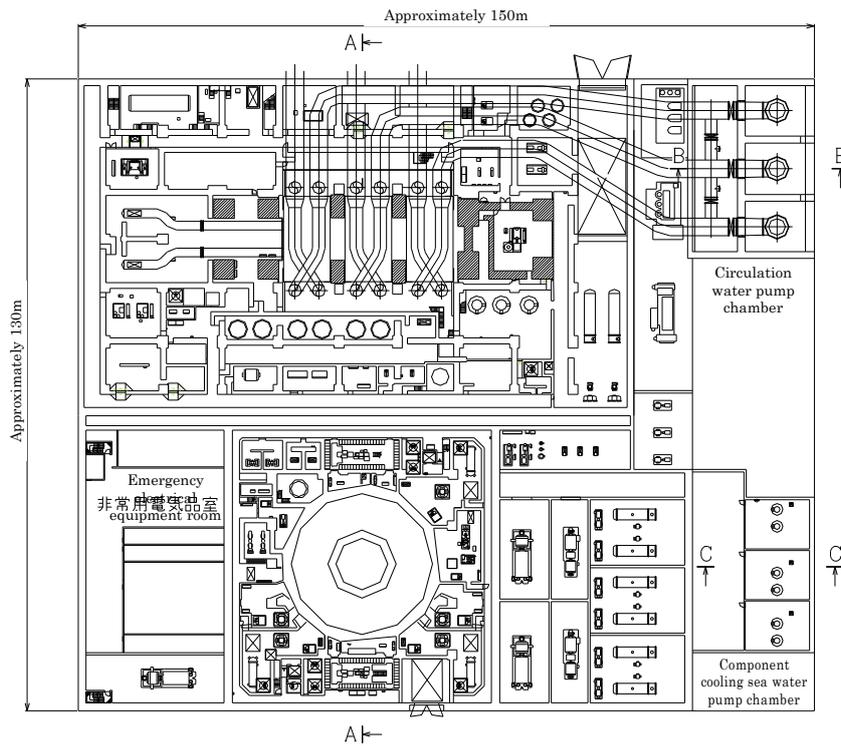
shows the layout of the common foundation type seismic isolated complex building:
